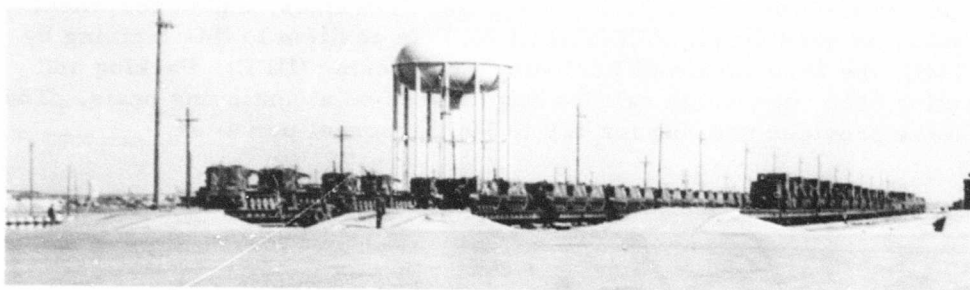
Concrete end ramps and asphalt staging area at Fort Hood.
